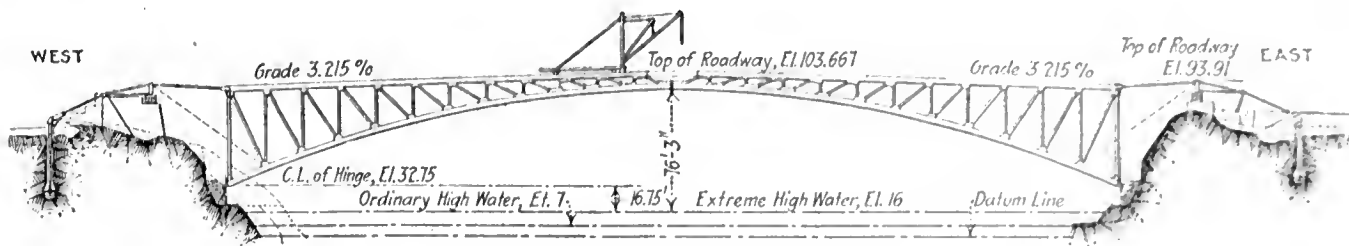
Erection Sketch of Reversible Falls Steel Arch.
